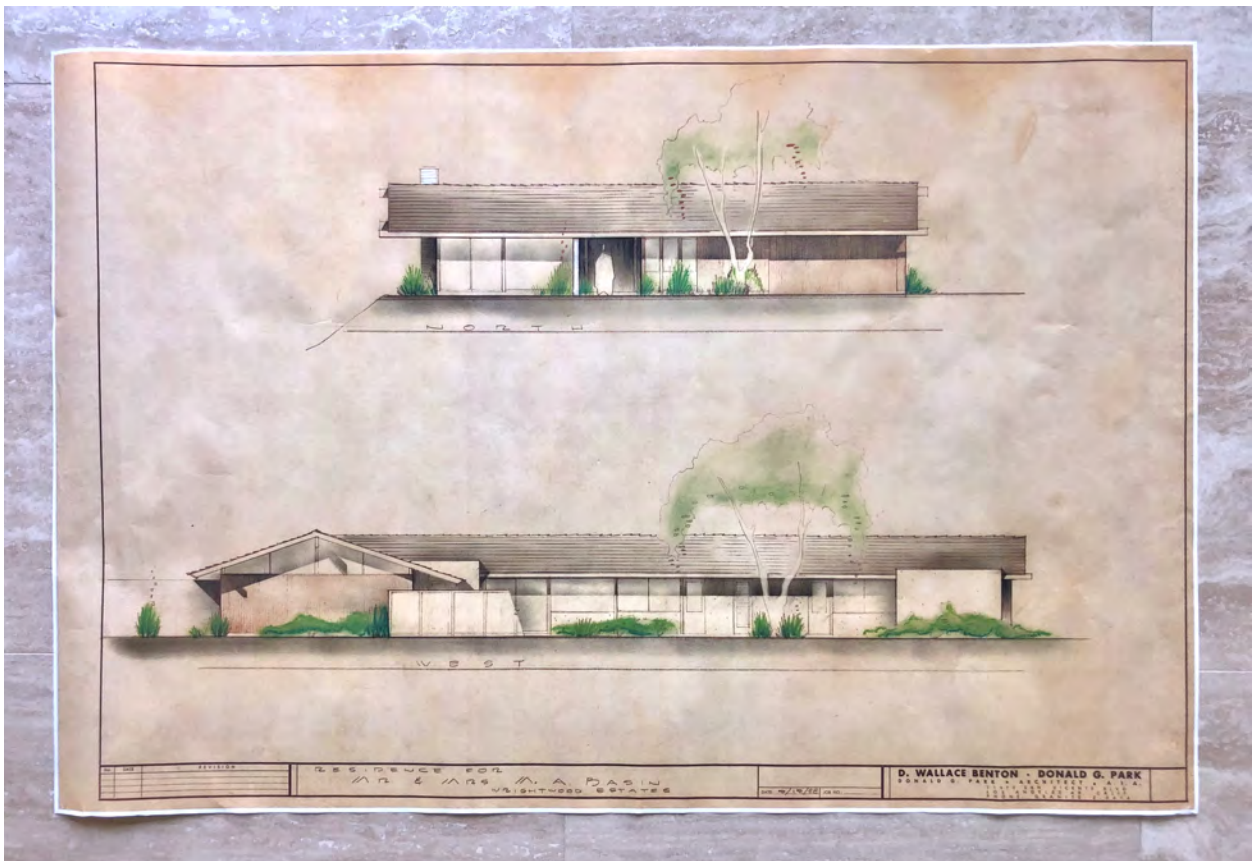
Benton and Park Architects. Basin Residence, north and west elevations, 1958.
